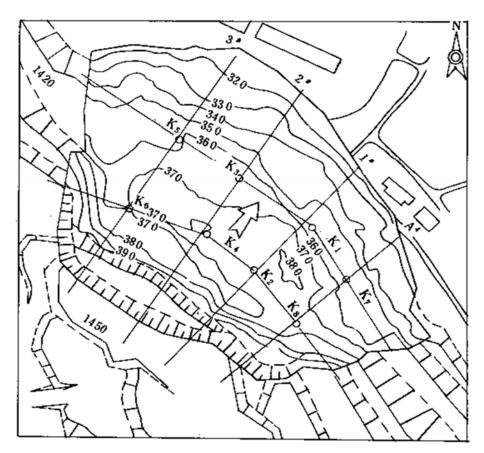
Plan of dumping area sliding and monitoring engineering
